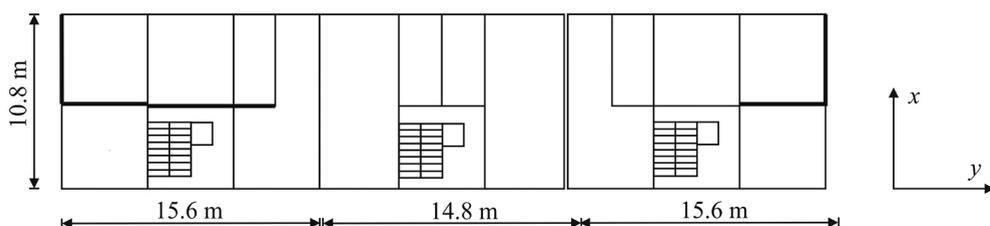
Floor plan of building “B1” with reinforcement as lines marked in bold [6]
